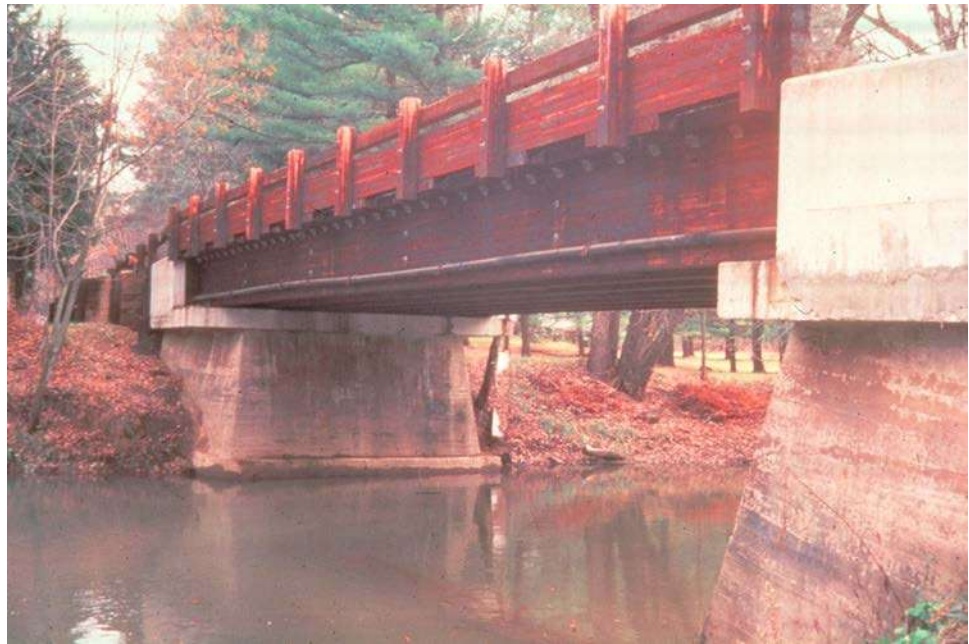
Elevation View of a Glulam Multi-beam Bridge
